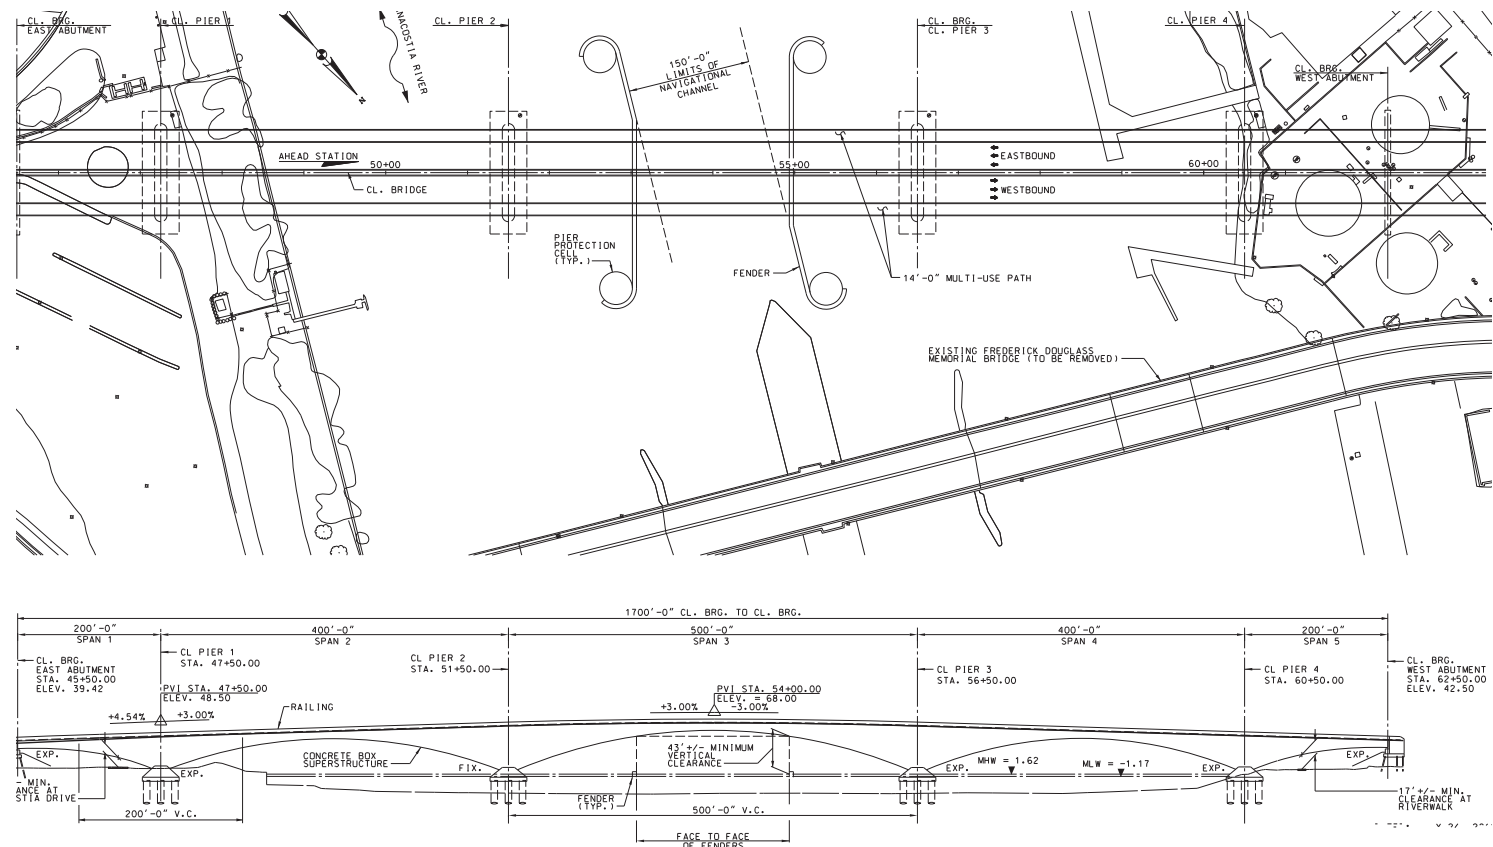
Bridge Alternative 5 - Plan and Elevation
